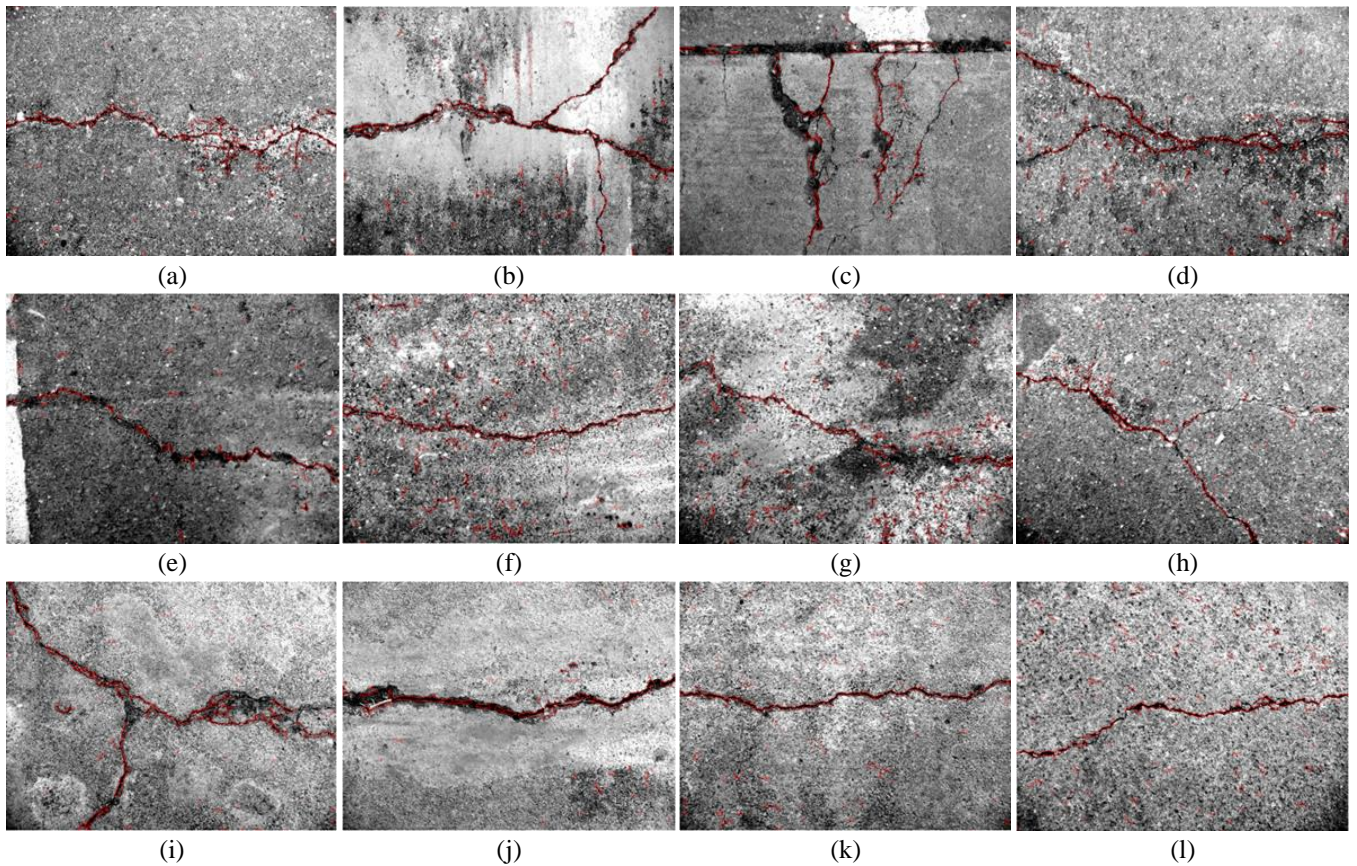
Segmentation result of concrete pavement cracks using CCE
